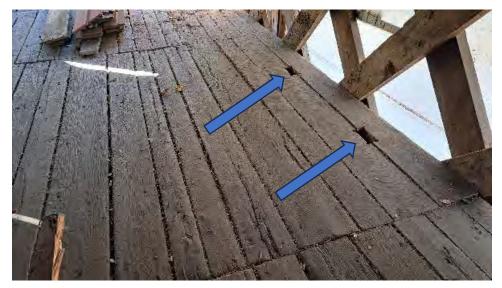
Floor decking Span 8, North side, with two common holes in Planks 1 and 2.
